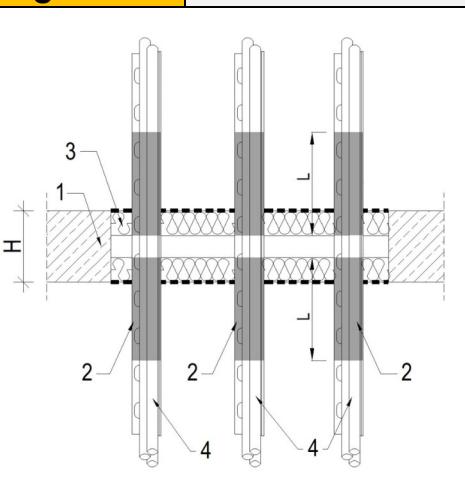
Large cables penetration seal, single or double mineral wool board
